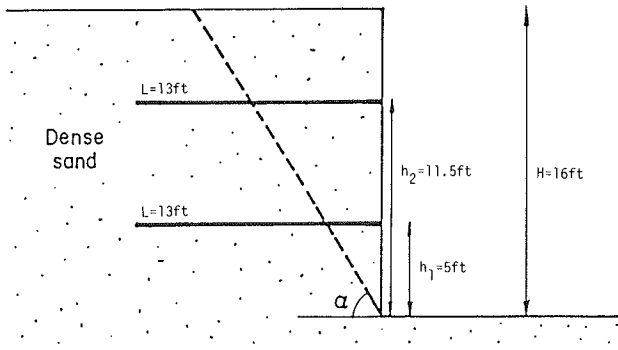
Design example—cross-section of wall and reinforcement layout.
